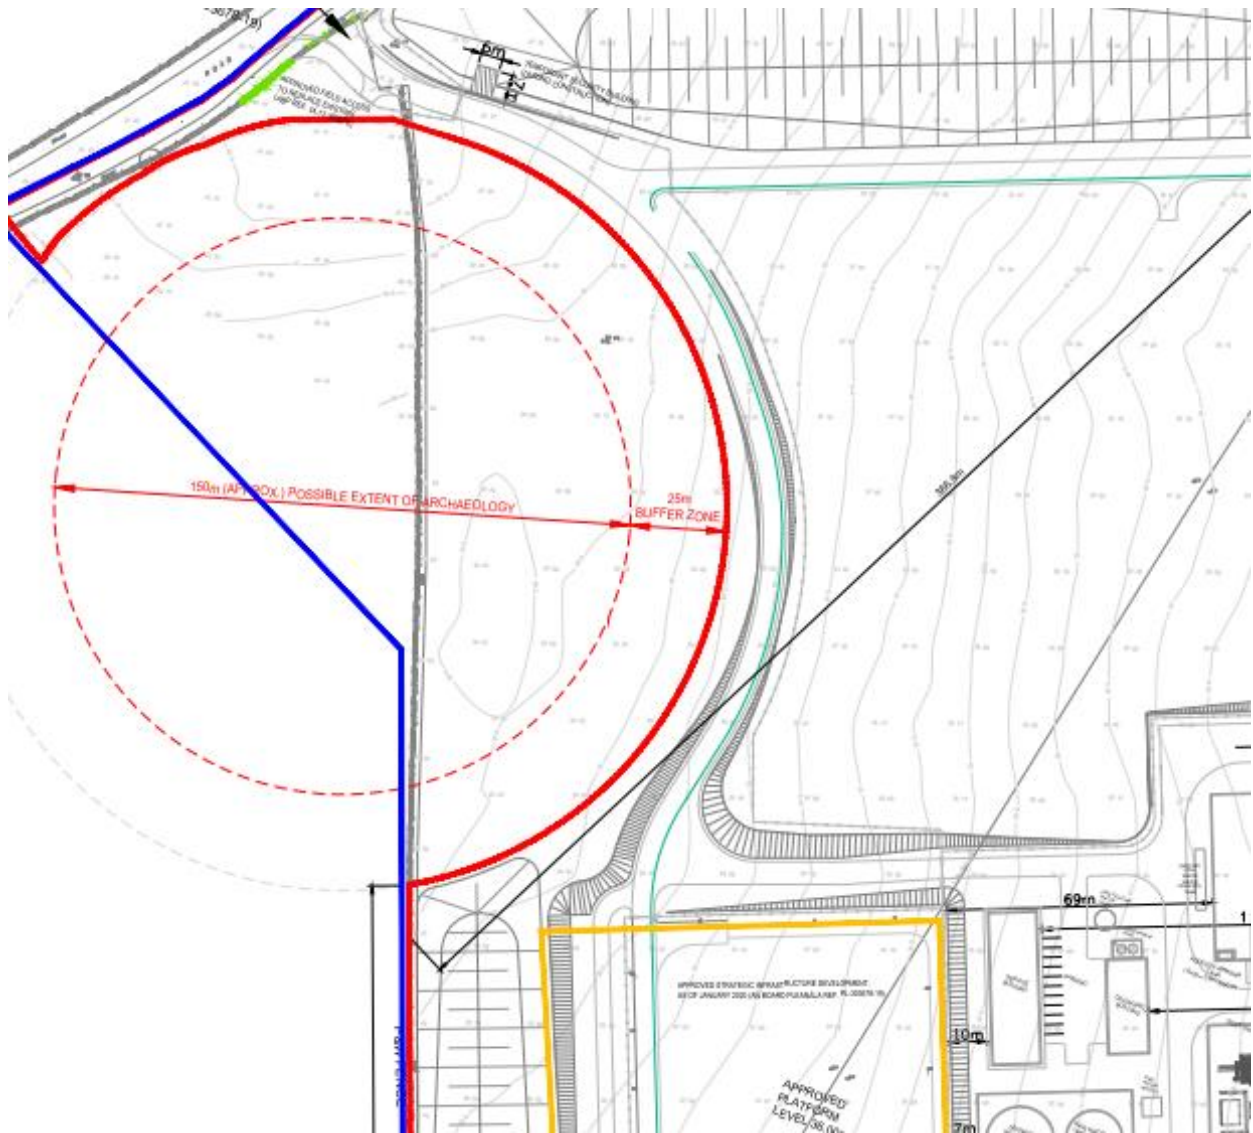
Excerpt of proposed development layout plan showing buffer zone established around embanked enclosure (ME027-078) in the northwest corner of the site (See drawing no. 60695232-PTN-DR-002)
